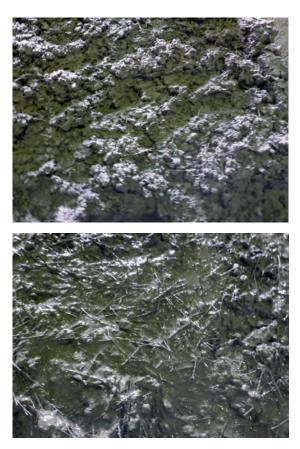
Sprayed on concrete shell – with steel fibres above – and polymer fibres below Source: TOO Schachtbau Kasachstan
